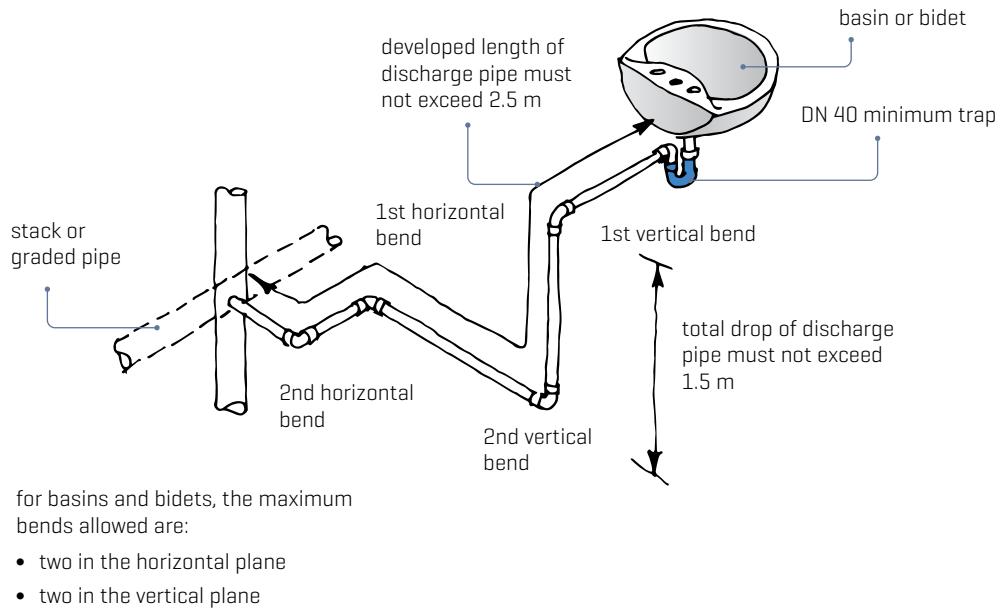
Connection of basins and bidets to a group-vented branch pipe or single stack.
